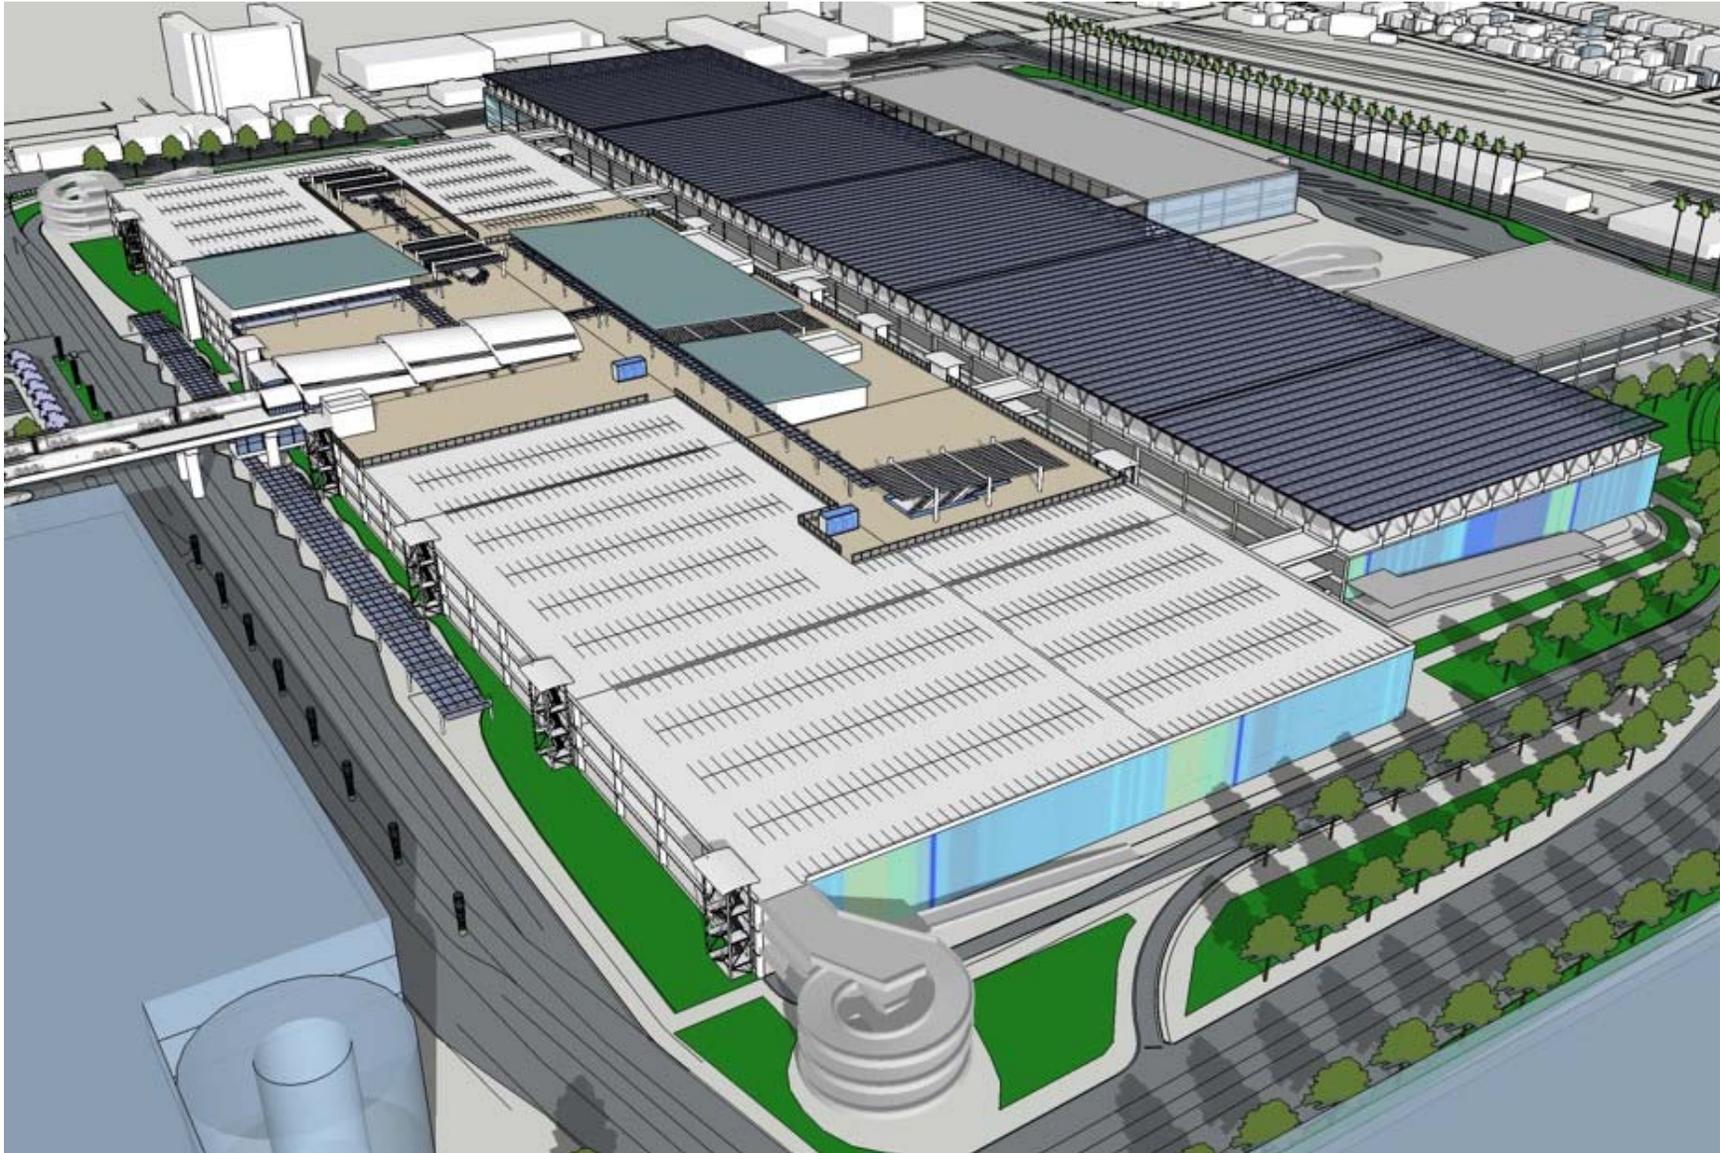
View from Southwest – RAC Garage, Idle Storage Building & QTA
